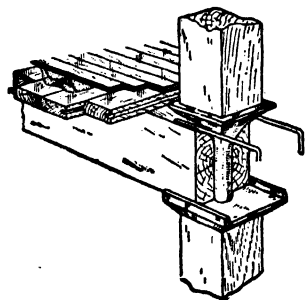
Detail of column and girder construction with cast-iron pintle.
